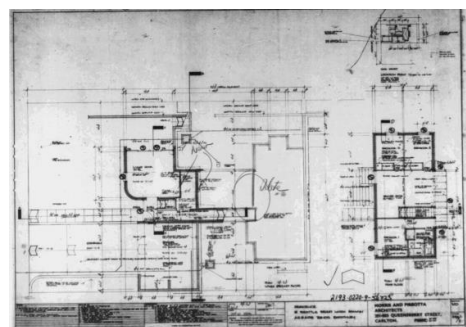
Original working drawing sheet. (Source: City of Boroondara)
